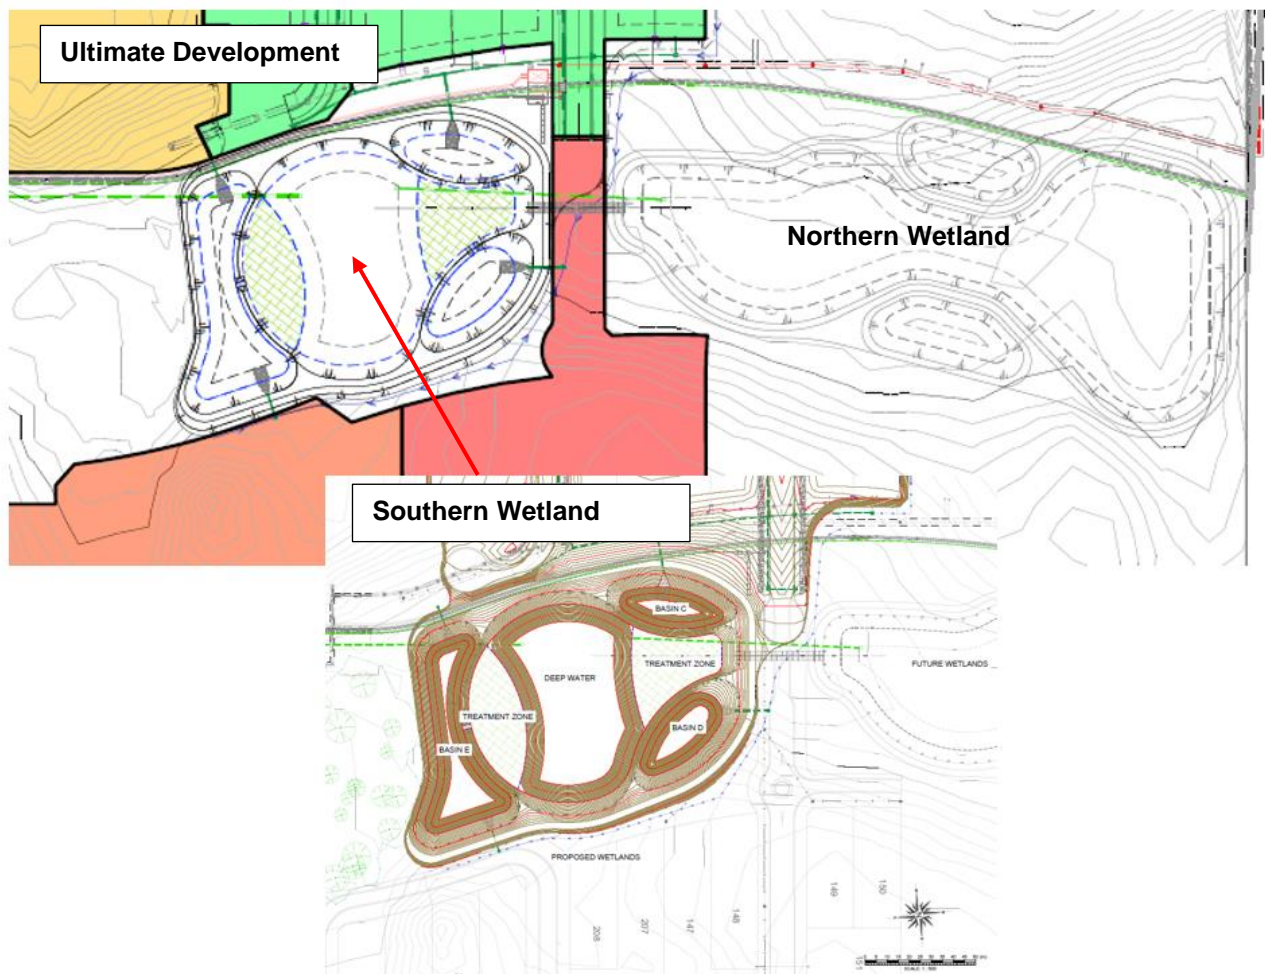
WSUD Asset – Indicative Layout (source: Development Outcomes)
